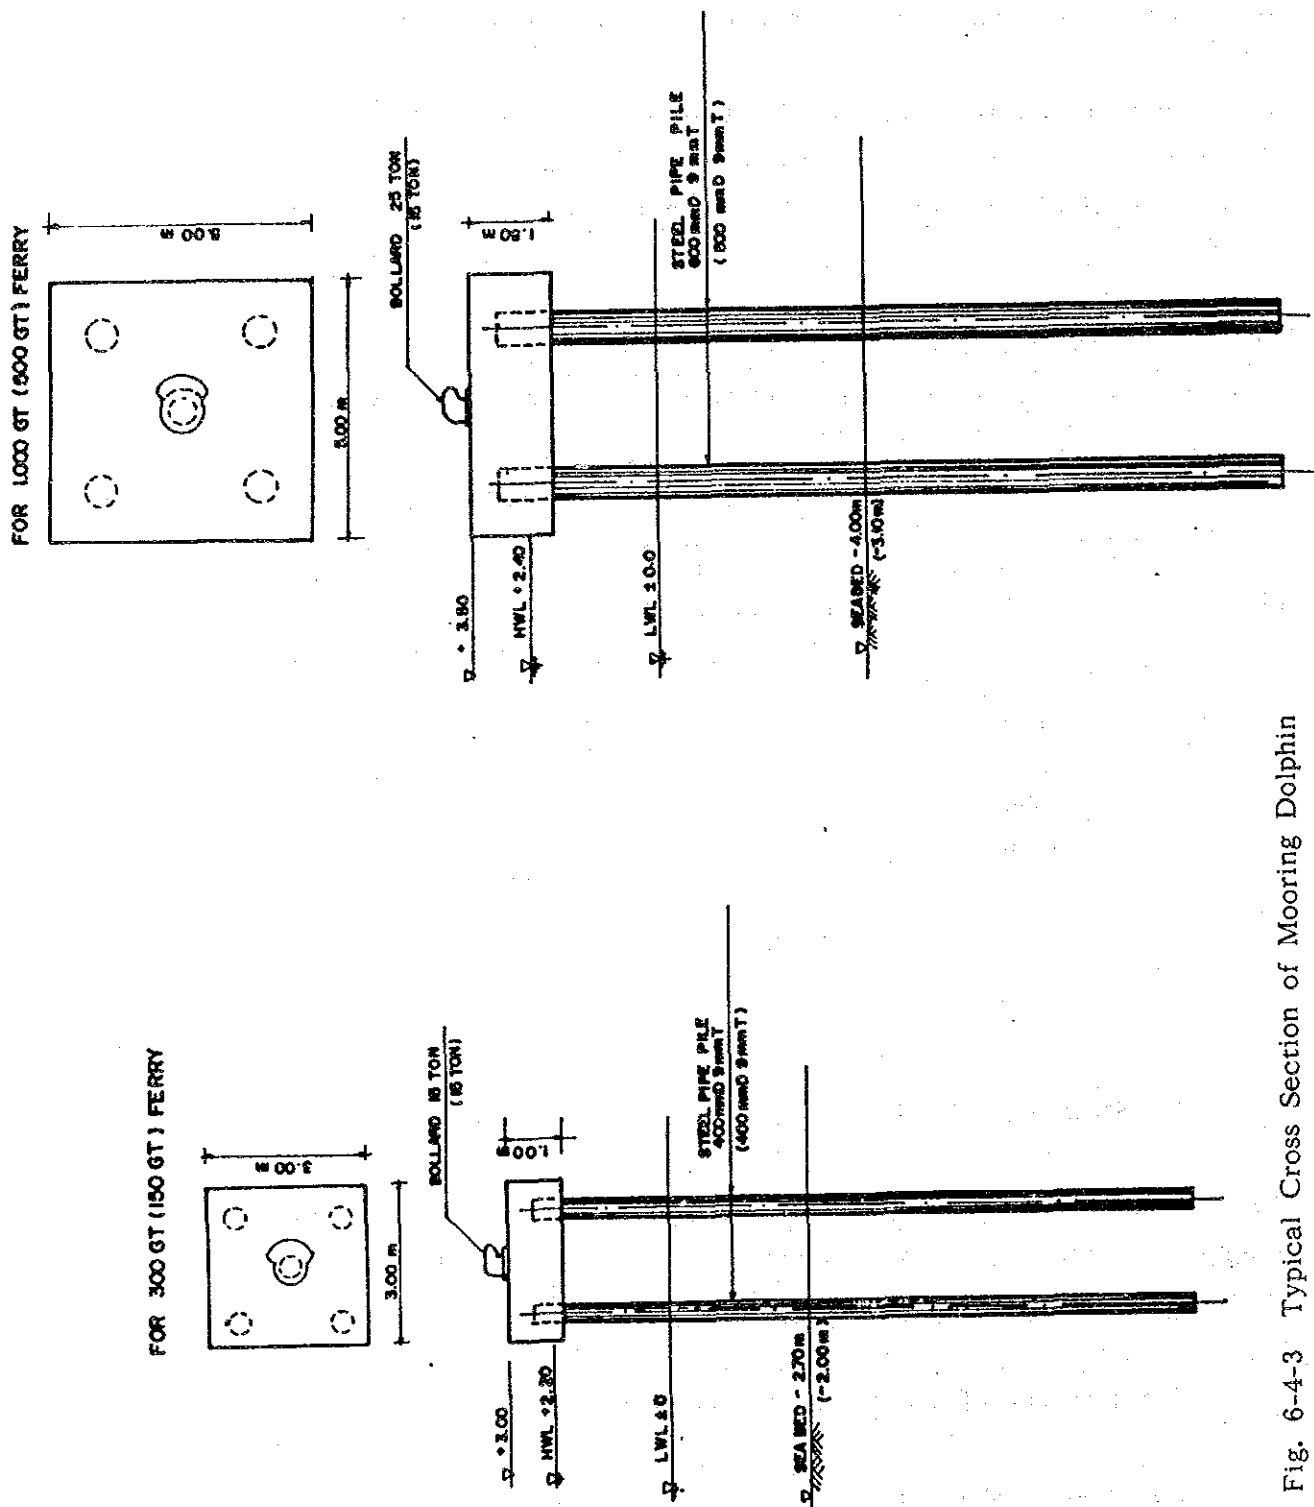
Typical Cross Section of Mooring Dolphin
